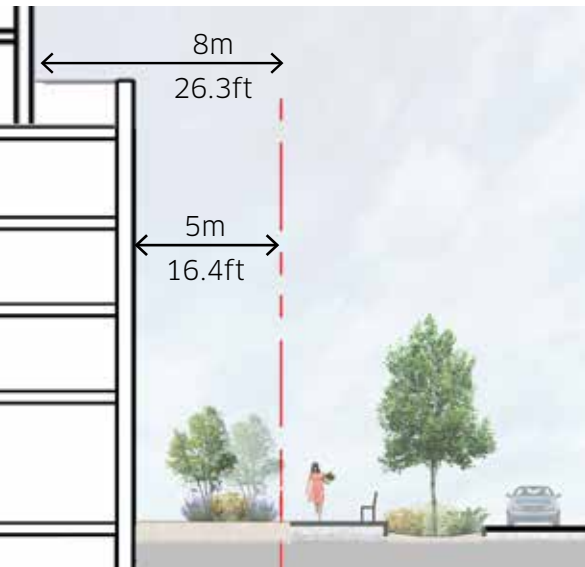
West 35th Ave. Setback (North and South Sides)
